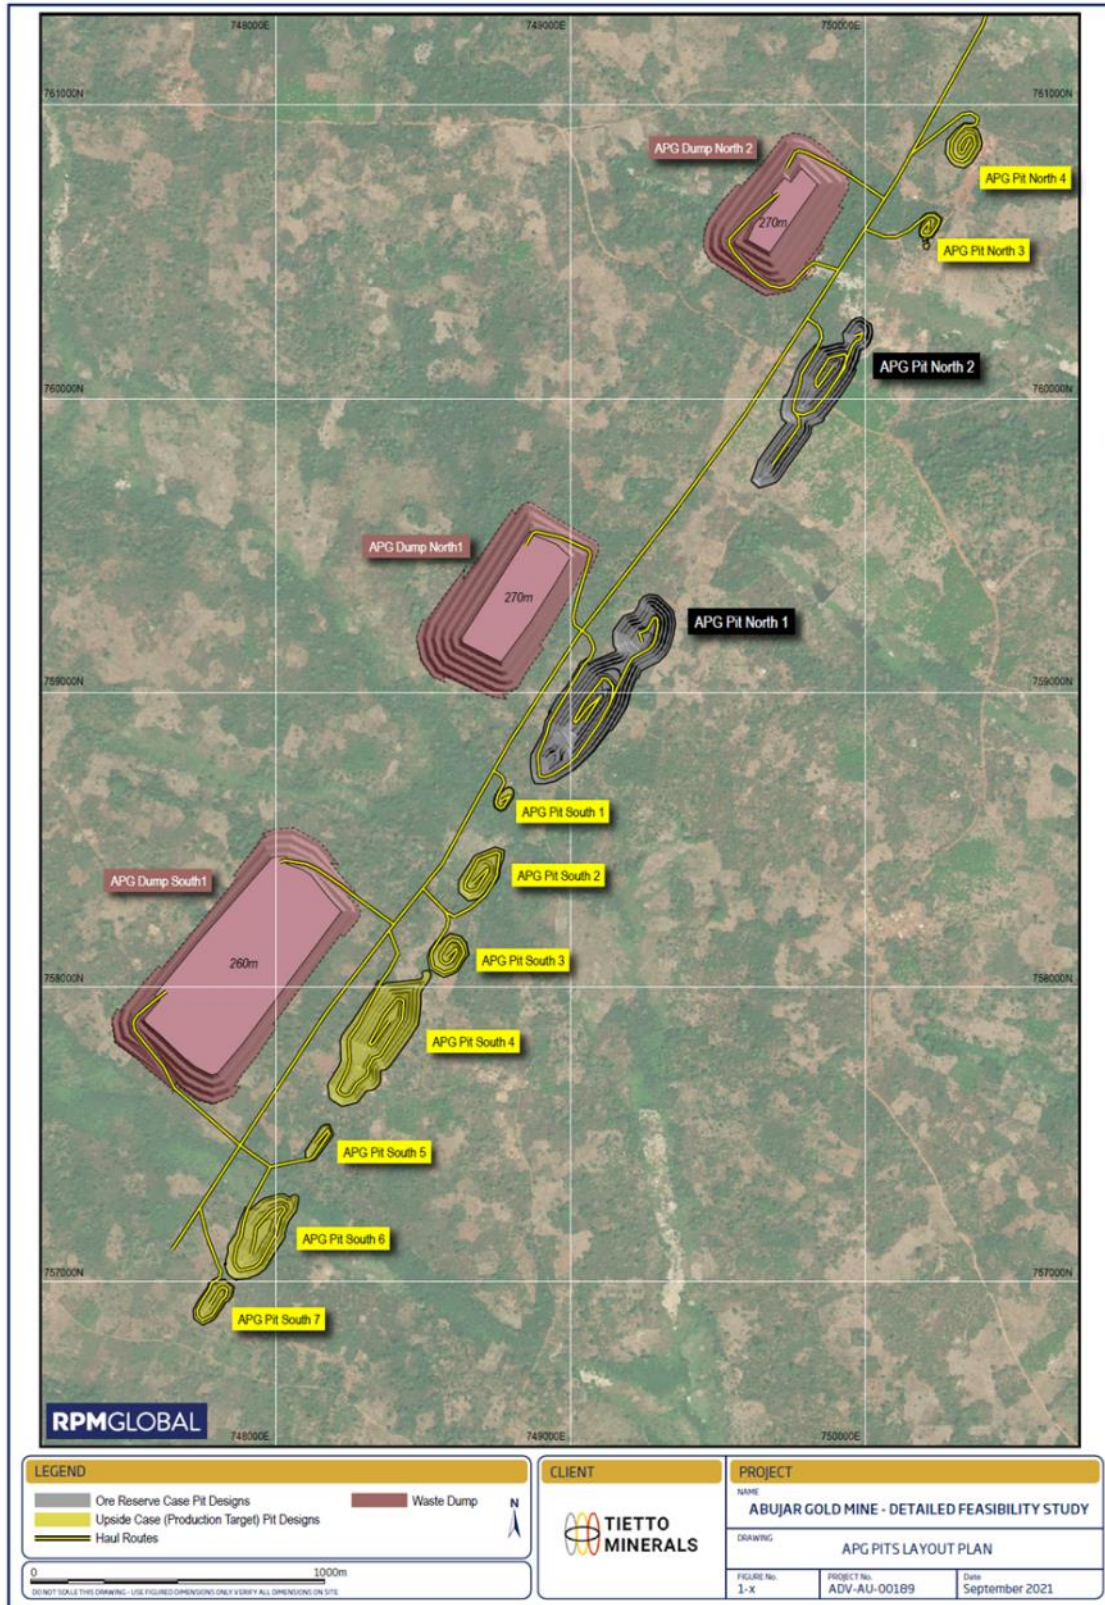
Proposed layout Abujar Gold Project – APG Open Pit
